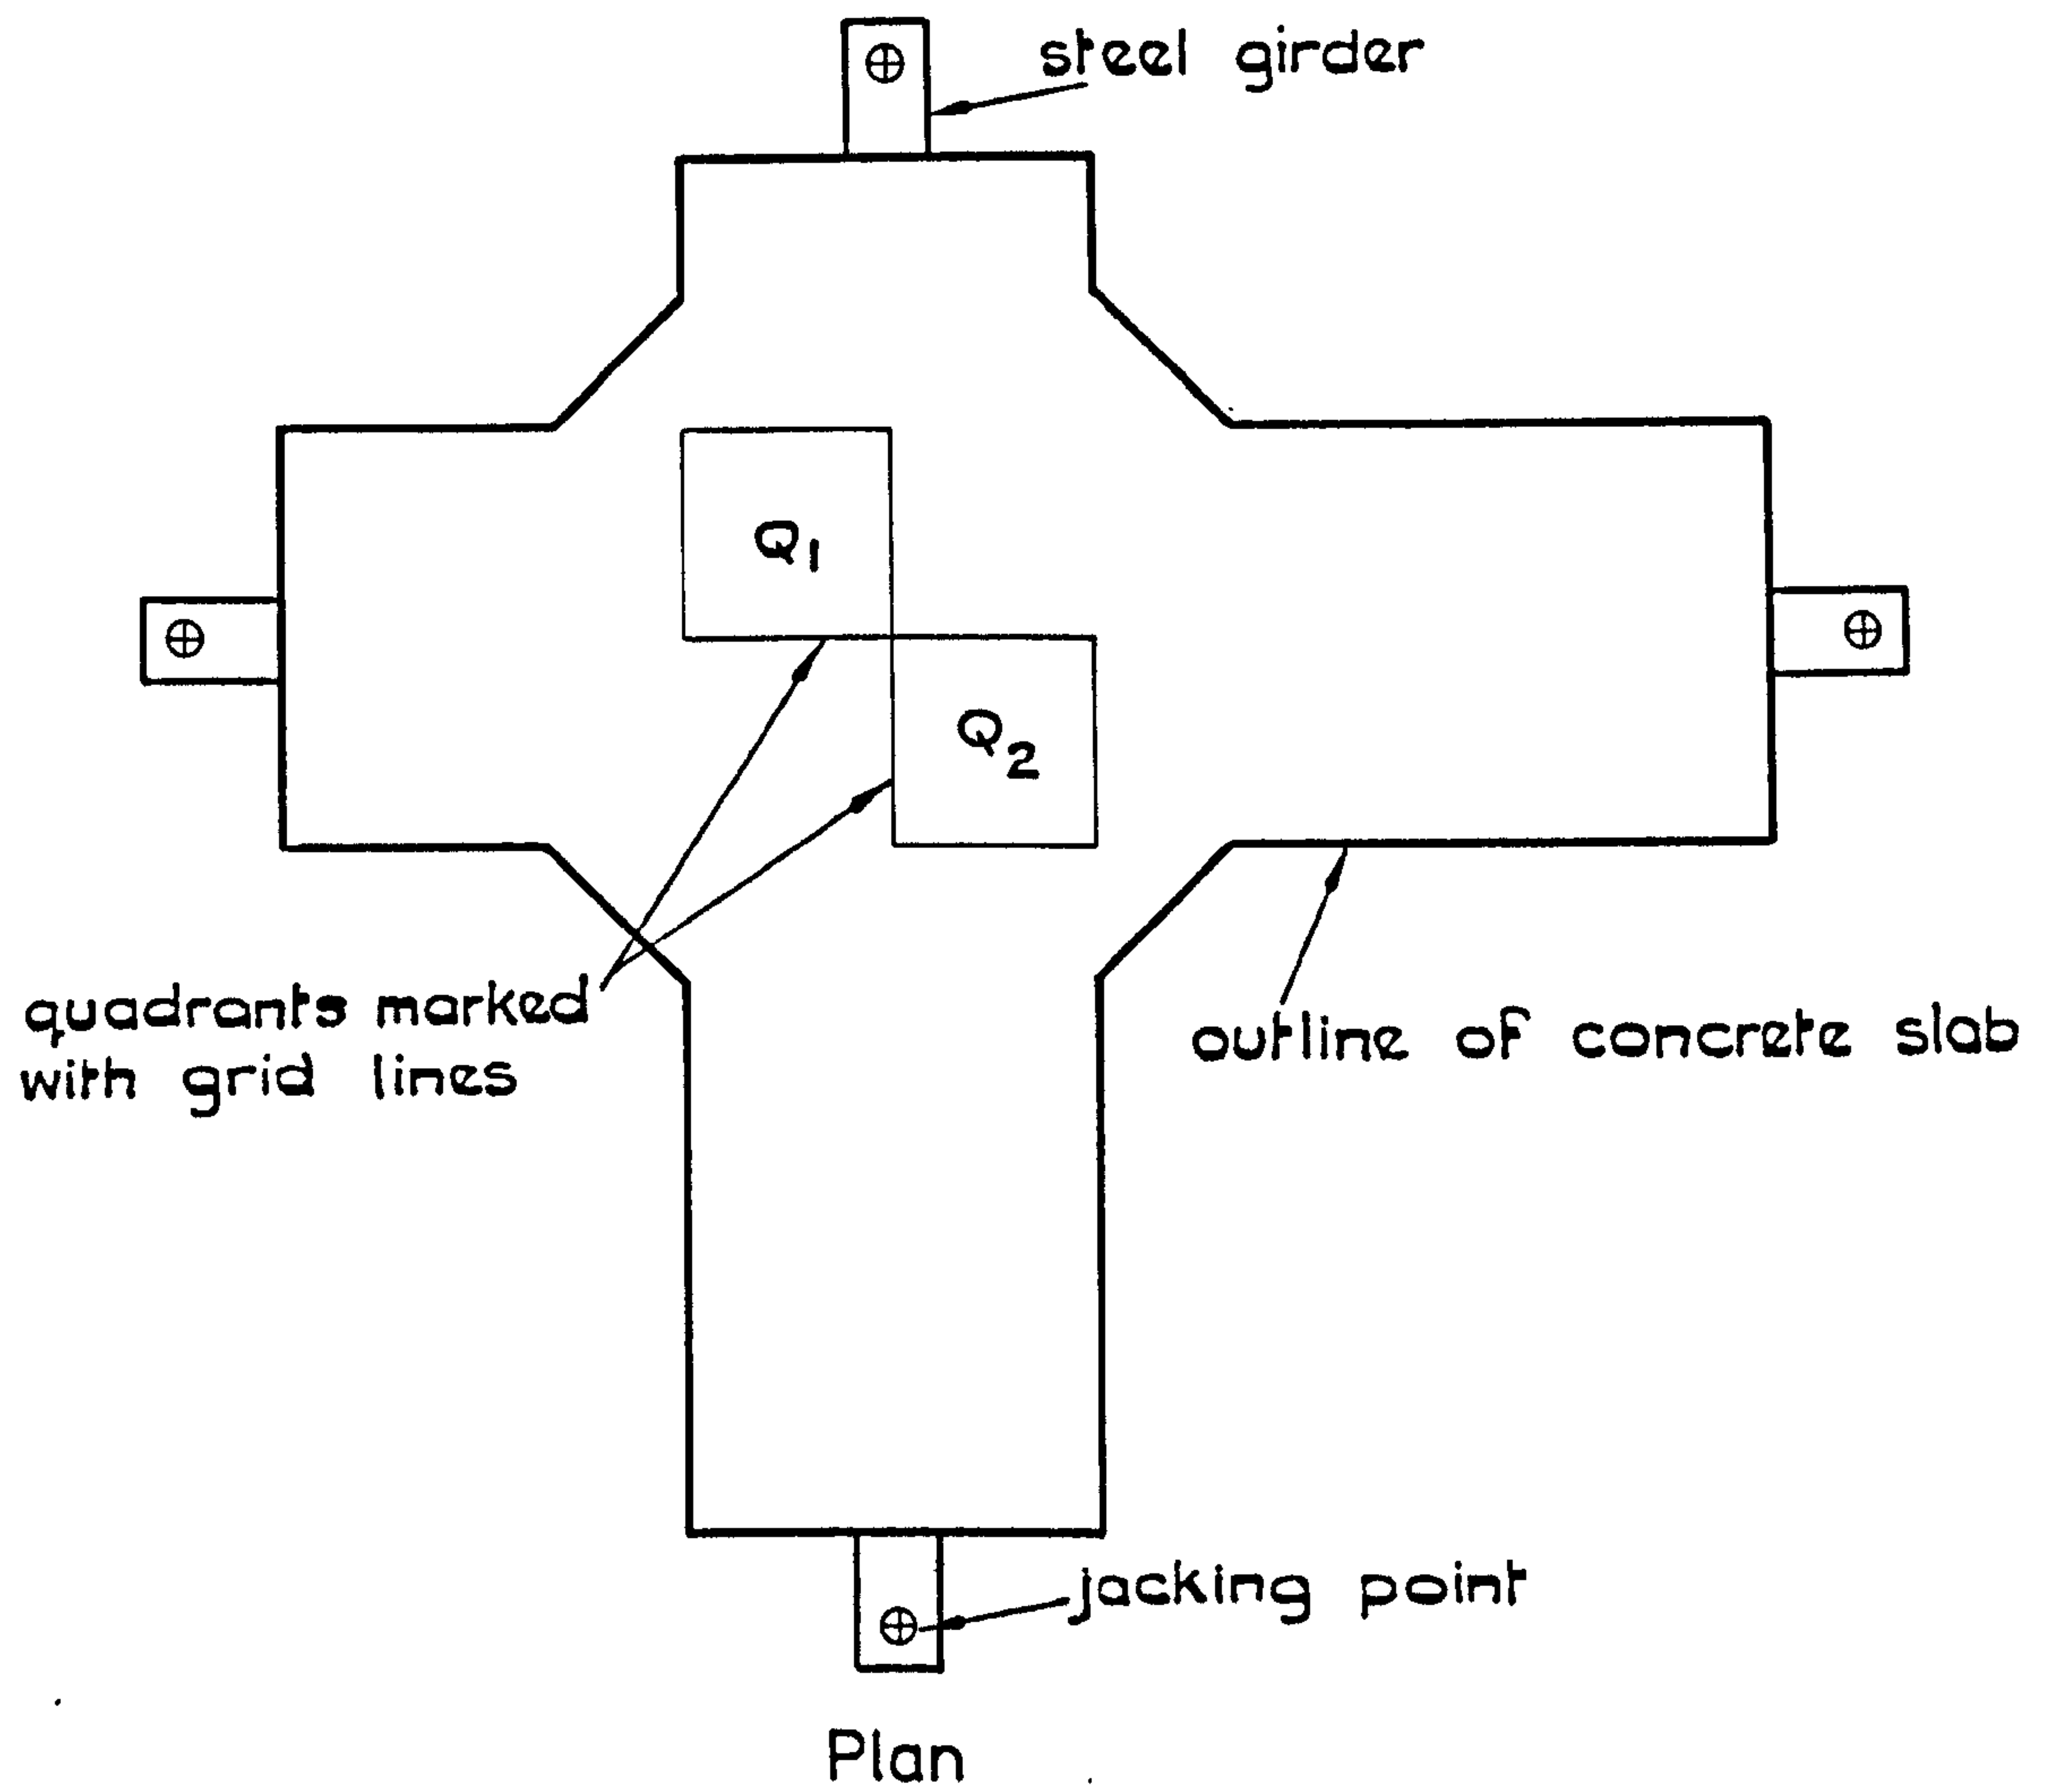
TEST RIG USED TO STUDY CRACKING IN
